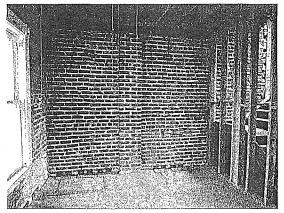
Interior photograph of exposed brick at south wall, fifth floor. Note minor efflorescence and deterioration of mortar (photograph taken on 02/27/2018).
